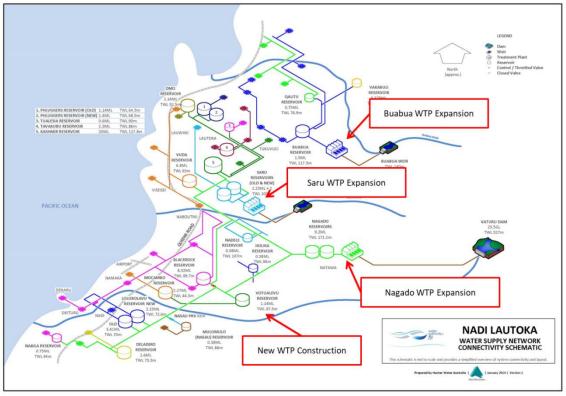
Augmentation Plan for Nadi/Lautoka WTPs
